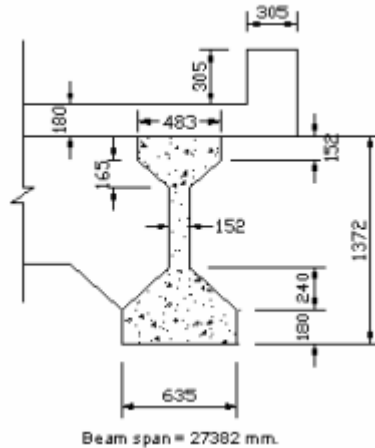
SECTION DETAIL OF PRE-CAST CONCRETE BEAM [10]
